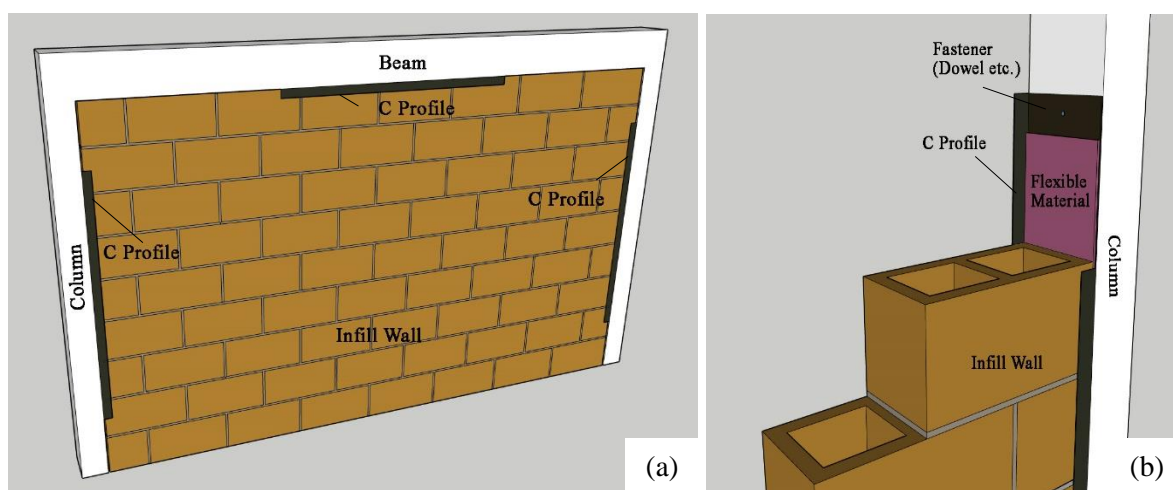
Infill wall-column flexible connection detail (a) general view (b) detailed view
